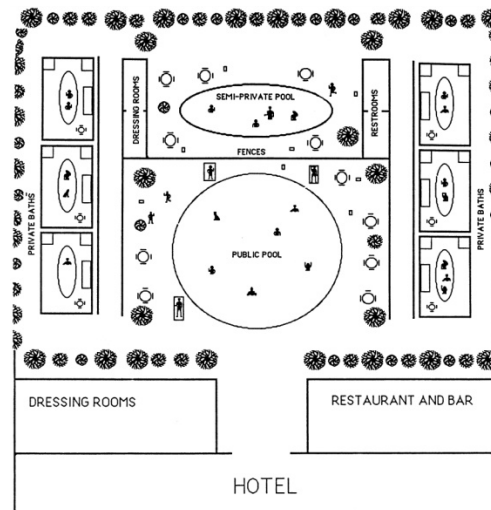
Typical spa design with individual private soaking tubs (Woodruff and Takahasi, 1990).
